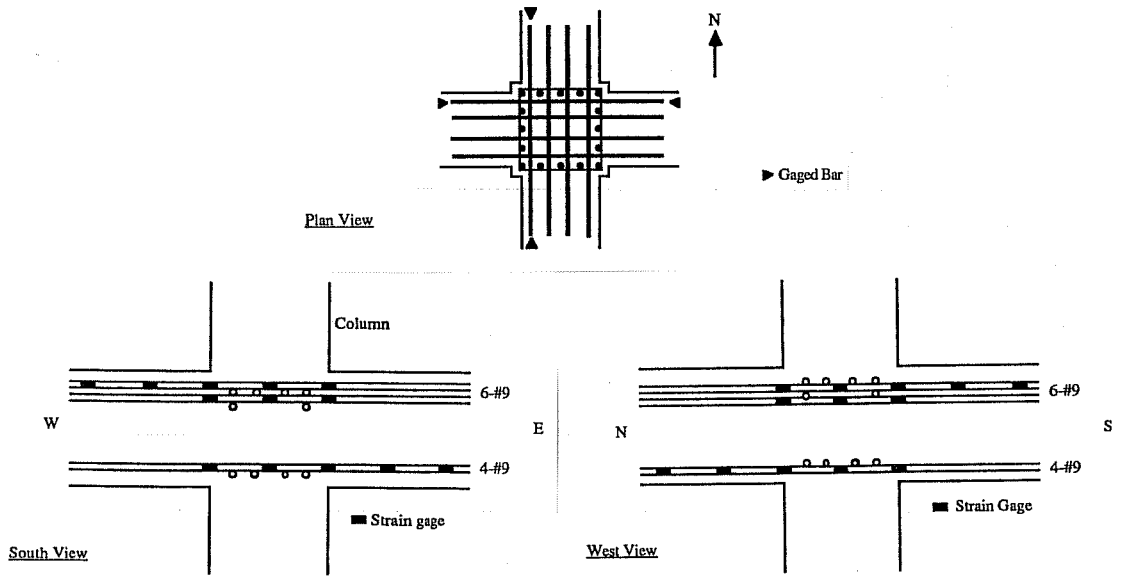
Strain gage positions on beam bars for Specimen J6
